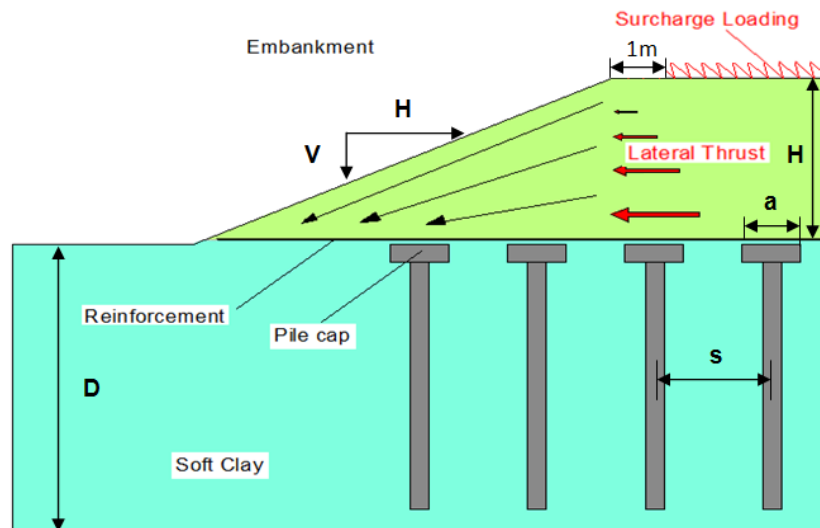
Geometric layout of generic case model of a reinforced pile embankment on soft soil
